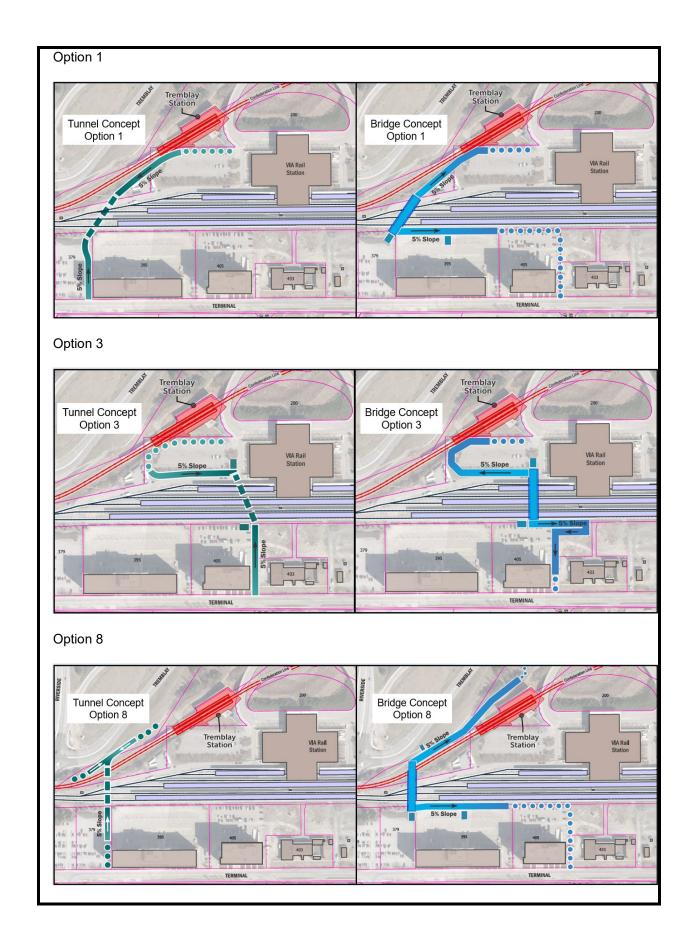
Routing for Tunnel and Bridge Concepts Developed Further
